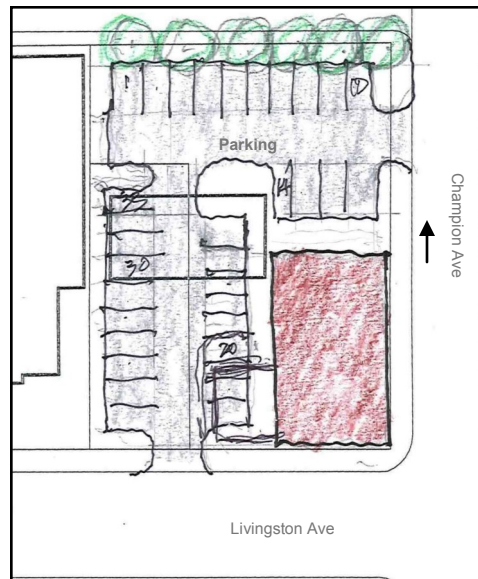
Site plan for the northwest corner of Champion and Livingston illustrating a new building to reestablish the corner and maximize parking.
